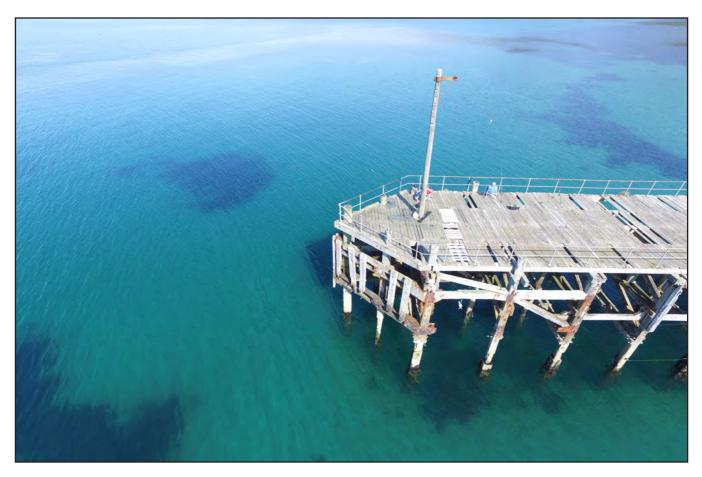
Aerial view of the north-northwest end of the pier (Trusses 1 to 4) (UAV image: DJI_0121)
